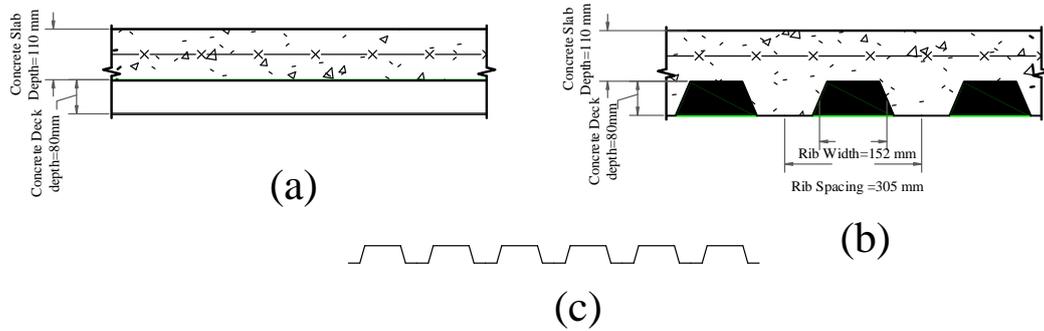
Floor deck detail (a) longitudinal (b) transverse (c) steel roof deck.
